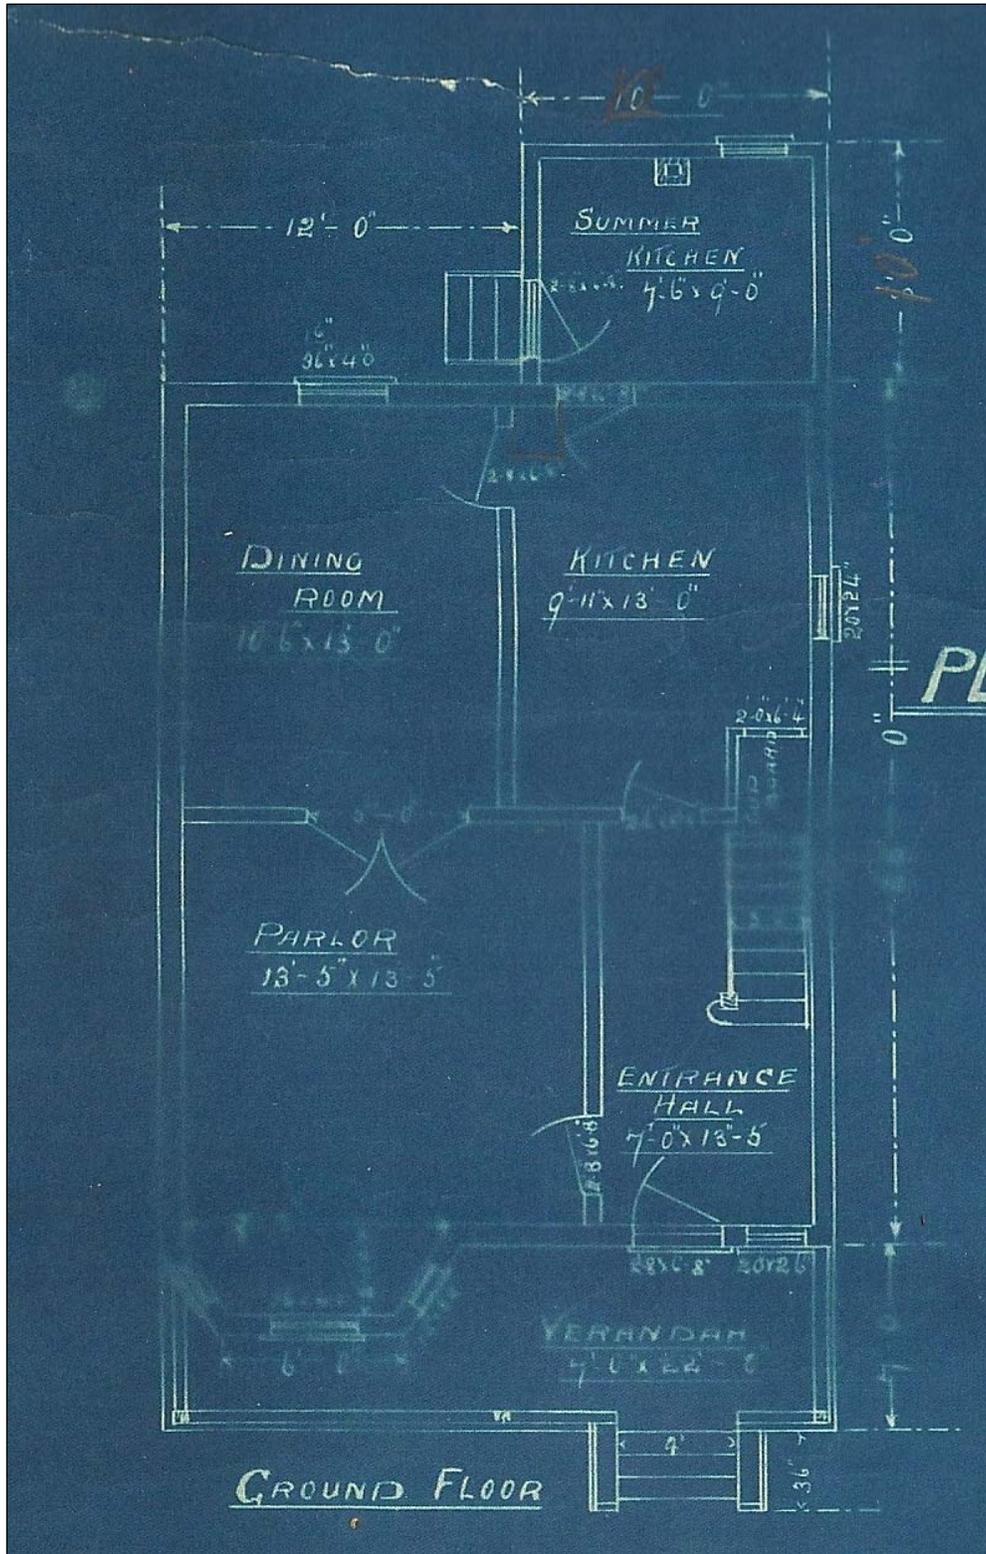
Architect’s Plans, Blais House, “Ground Floor”. (Courtesy of owner.)
